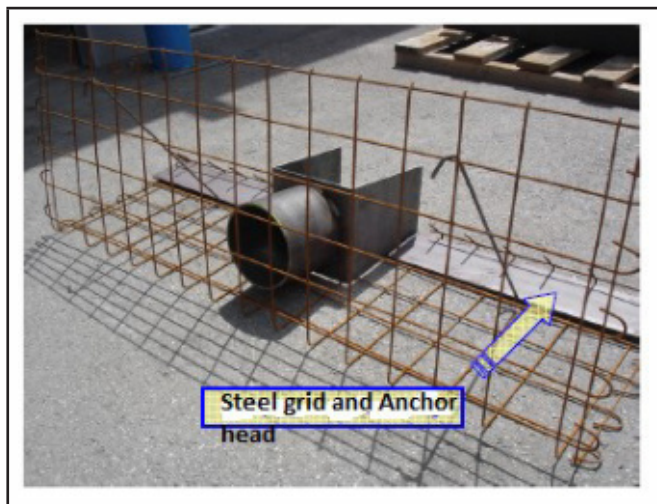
Steel mesh and anchor/nail head frame placement in the proposed slope protection with steel mesh facing. All steel used in construction should be galvanized.
